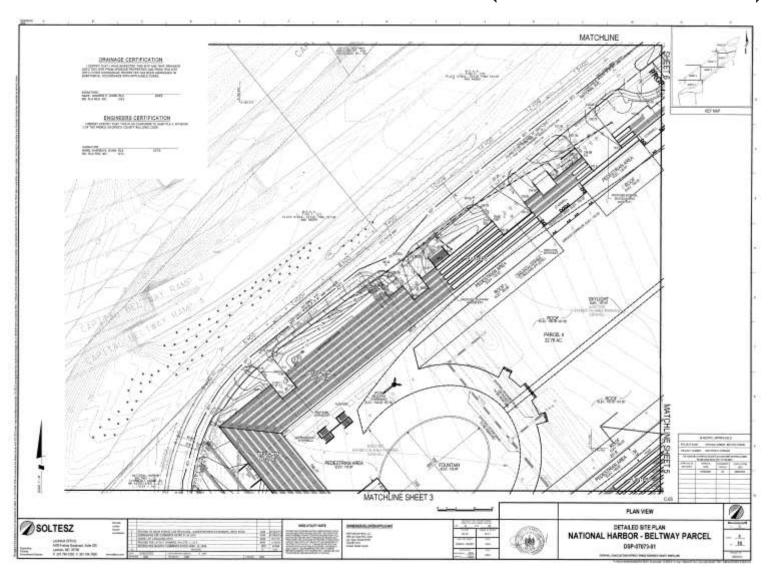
DETAILED SITE PLAN SET (PAGE 3 OF 10)
